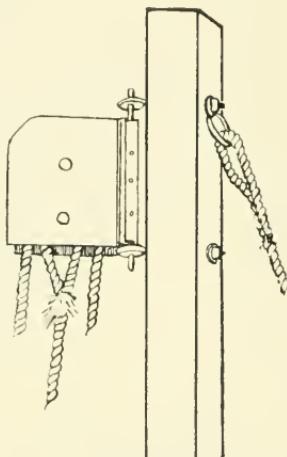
Derrick Pole.*—Top fitted with a specially made metal pulley hinged on supporting bolts that pass through the pole. The guy rope is attached to a ring clamped under the nut holding one of the bolts.
